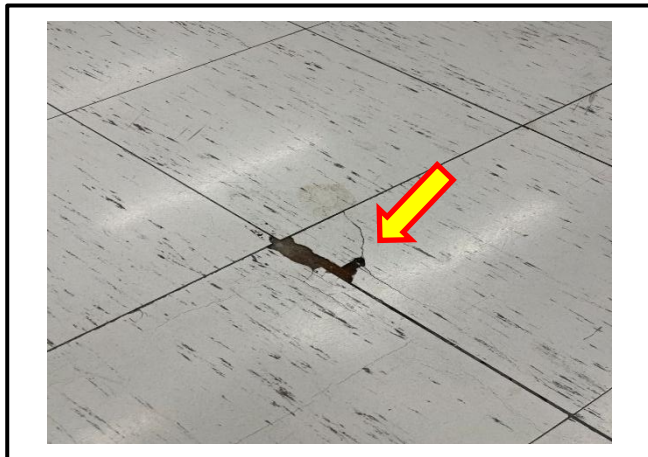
View of the damaged asbestos-containing 12"x12" white/grey vinyl floor tiles observed in Room B133.
